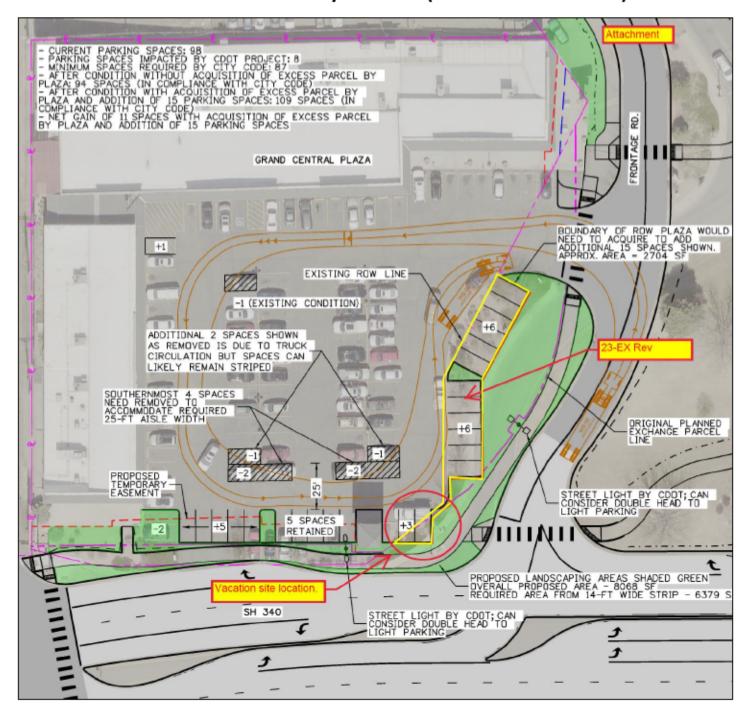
Preliminary Site Plan (200 W Grand Avenue)
